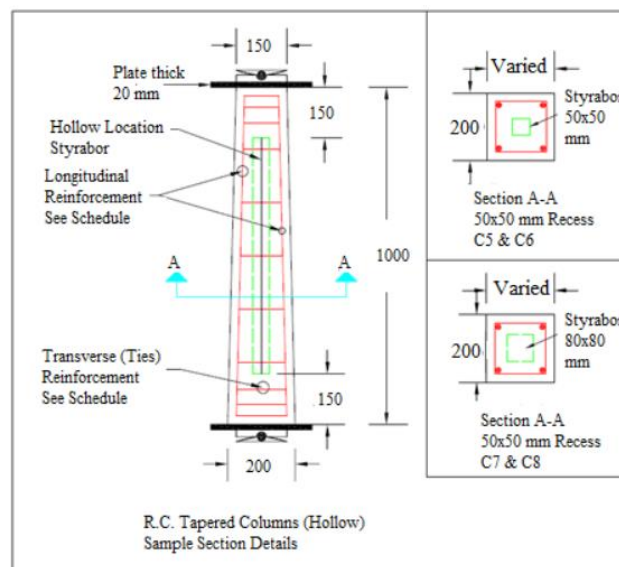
Dimension and Details of R.C. Tapered Columns (hollow section) [49]
